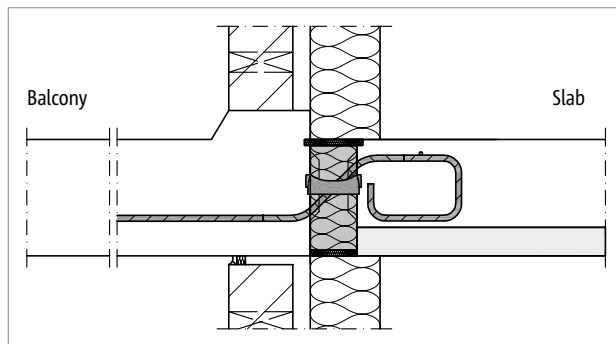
Schöck Isokorb® T type Q-E-W-V: Point connection
